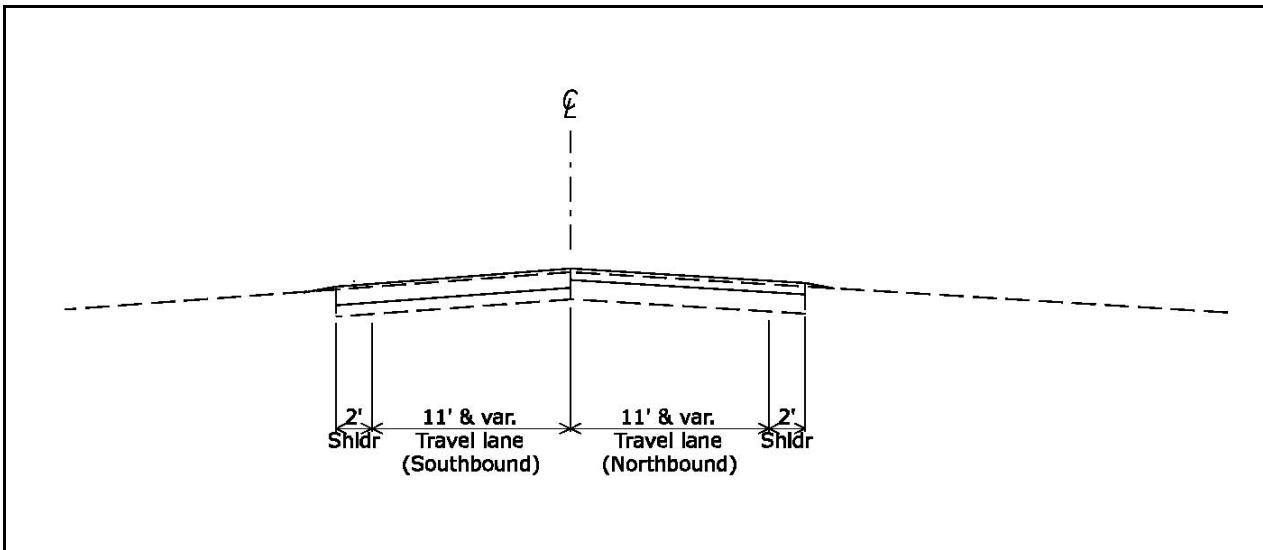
A cross section of the proposed road under Alternative B, matching the existing road dimensions, is shown.
